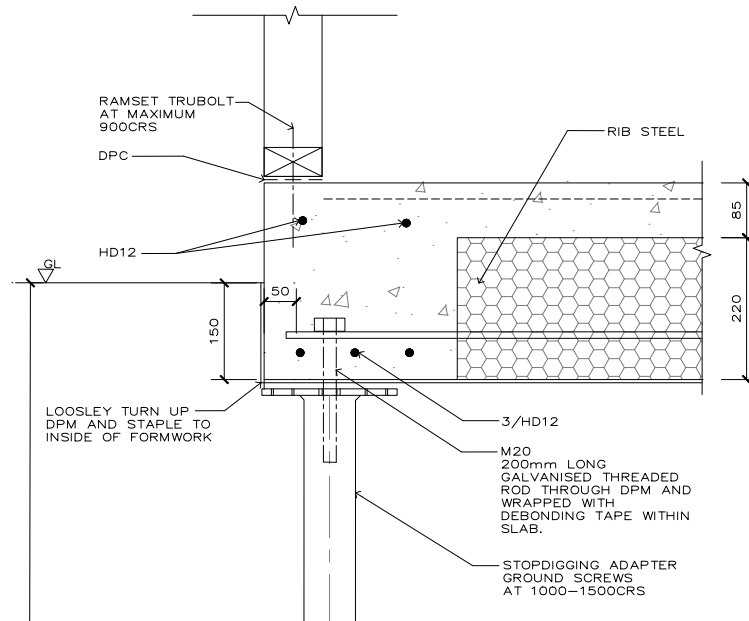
GROUND SCREW SUPPORTING CONCRETE SLAB
